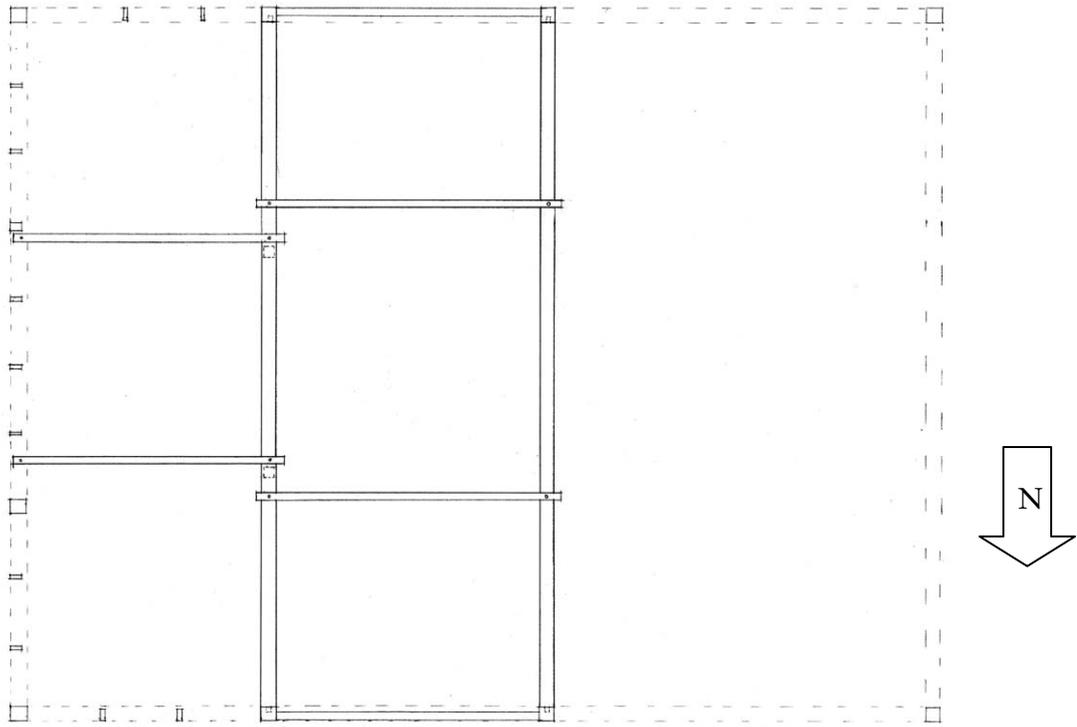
New Barn, plan view of framing illustrating two middle bents, bridging beams, timber posts, and 2 by 6 studs, based on visible elements (not to scale, 2005).
